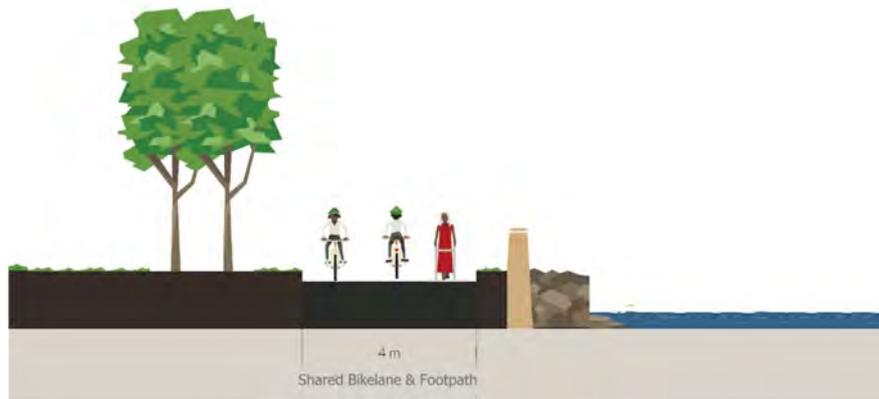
Route 8A, 8B & 8C, Cross Section B-B Proposed
